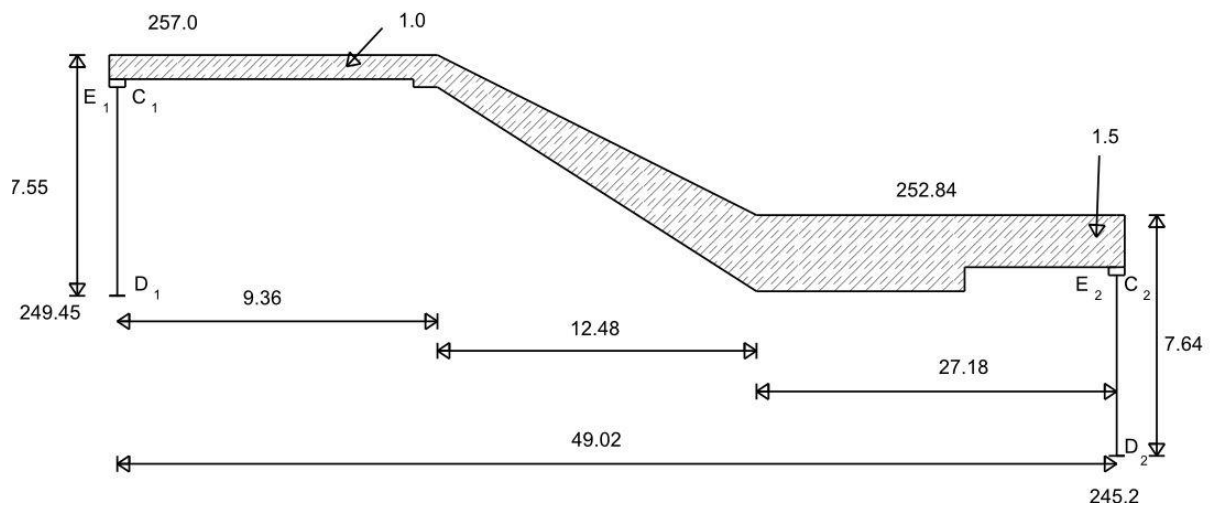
Undersluice Floor Section (ABCD v1.0)
